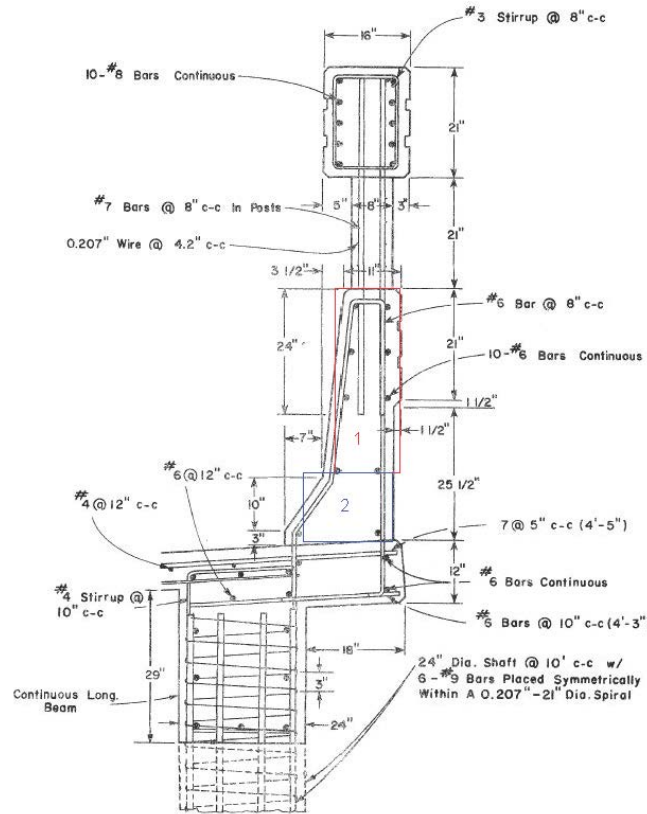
Cross Section of the Modified T5 Bridge Rail and Modified Bridge Deck.
